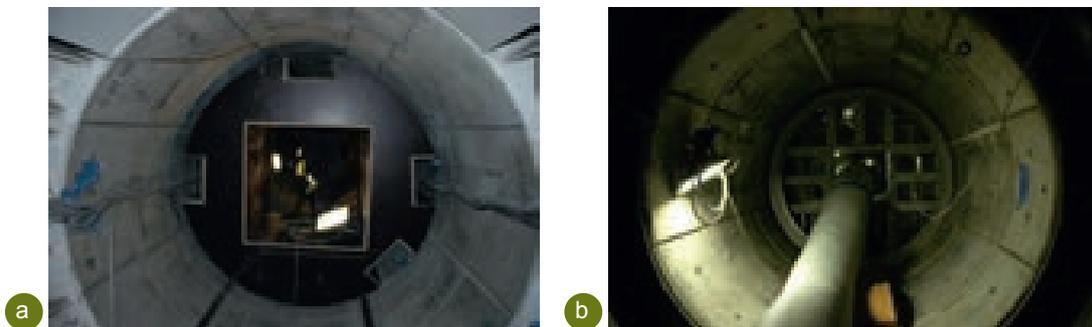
(a) Wooden mockup cylinder to test the feasibility of passing the steel cylinder through the PRACLAY gallery; (b) The steel cylinder is placed about 2 m behind the location of the hydraulic seal.
